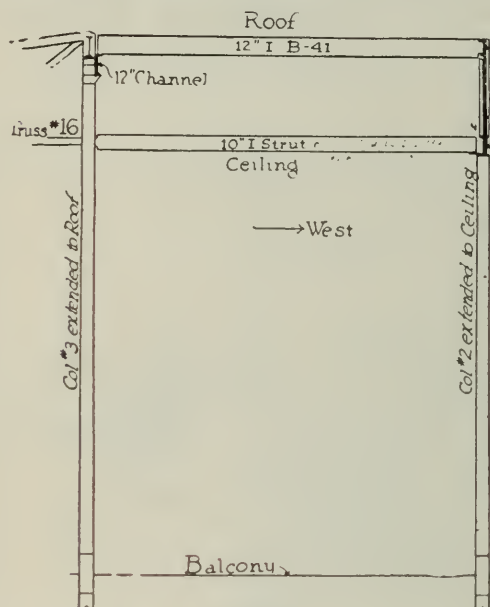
Showing that Col*2 and the Strut supporting roof beams were not braced on the East side
